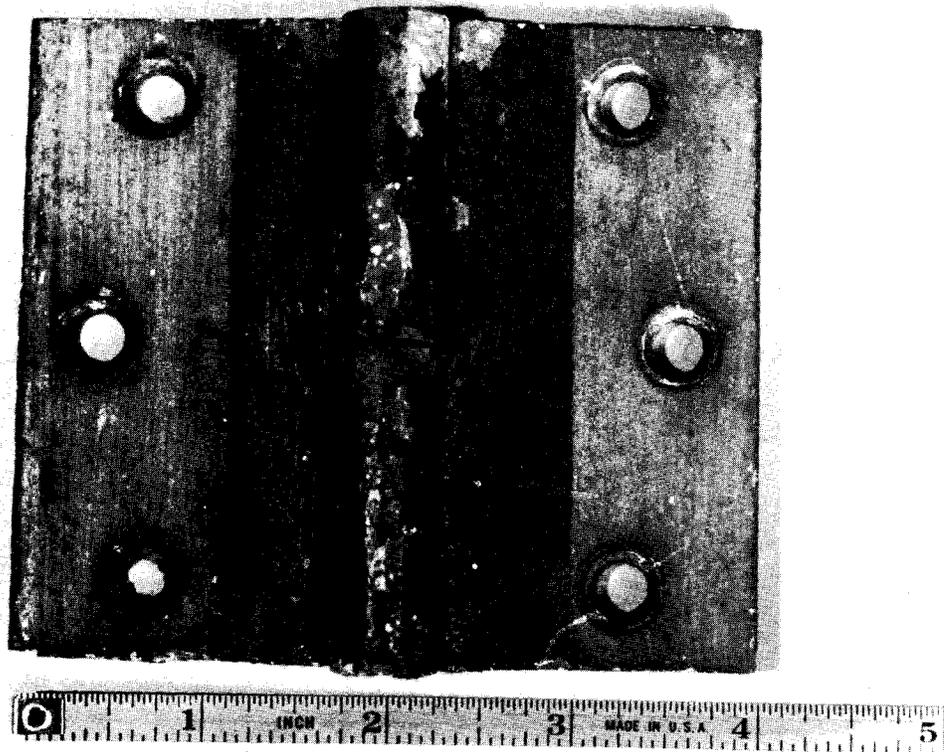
Penniman House: Typical Two-Butt Interior Door Hinge (1984).
